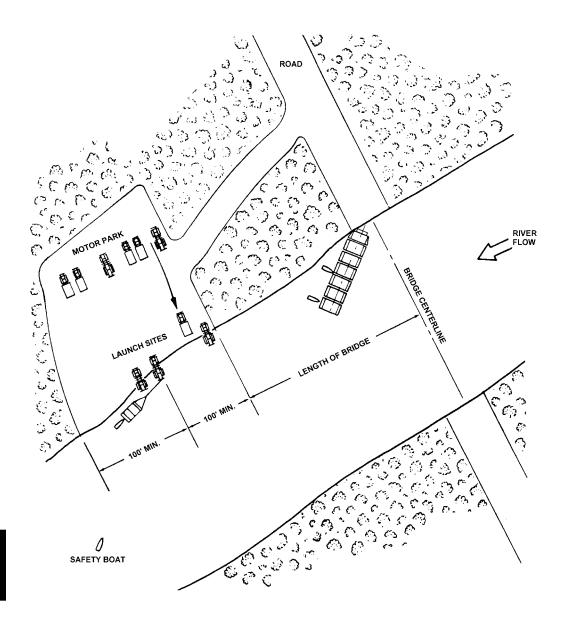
Bridge Assembly Site Layout for Multi-Launch Site (Swinging Bridge Assembly).
